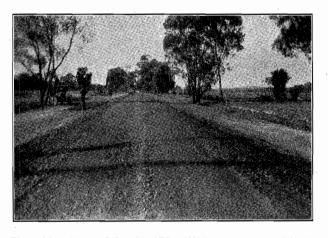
"Mixed-in-Place" Section under Traffic.
